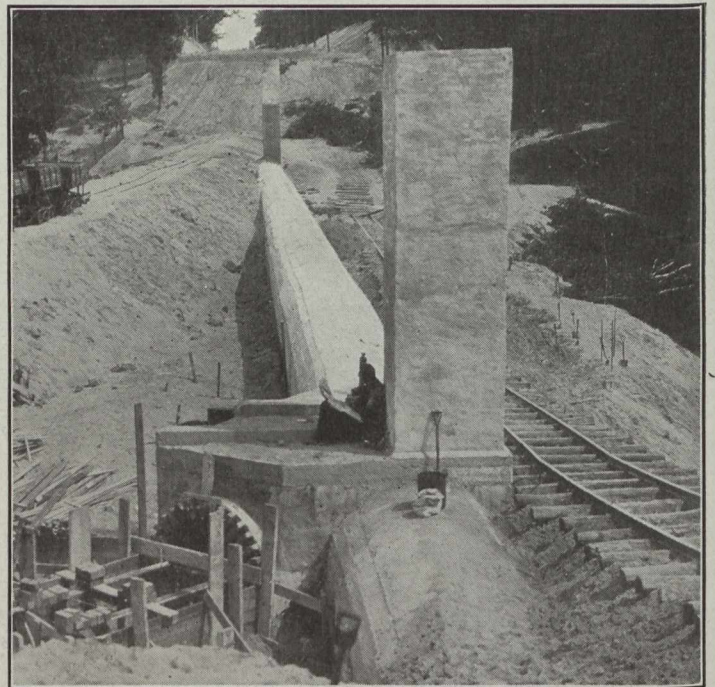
The Bloor and Clendennan Junction, Looking East, Showing Manholes to Future Grade of Bloor Street, and the Earth Fill Under Way.
